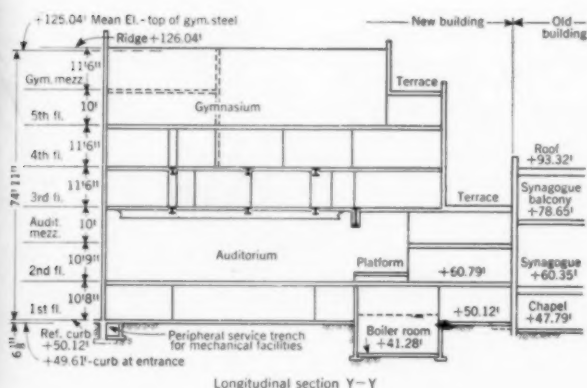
Tonnage of steel required for plate-girder design would have been double that required for one-story Viereendeel trusses.
